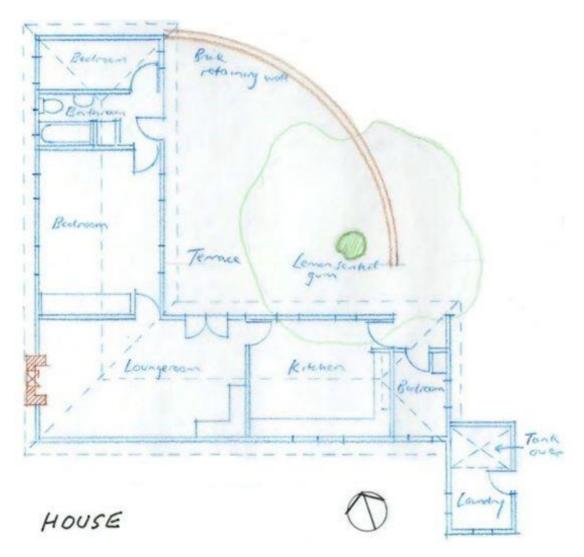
Floorplan of the Mount Omei house, built 1947-48. Sketched by Geoff Ashley (2016, pp30, 31) (no. '6' in site plan in Image 1.1).
